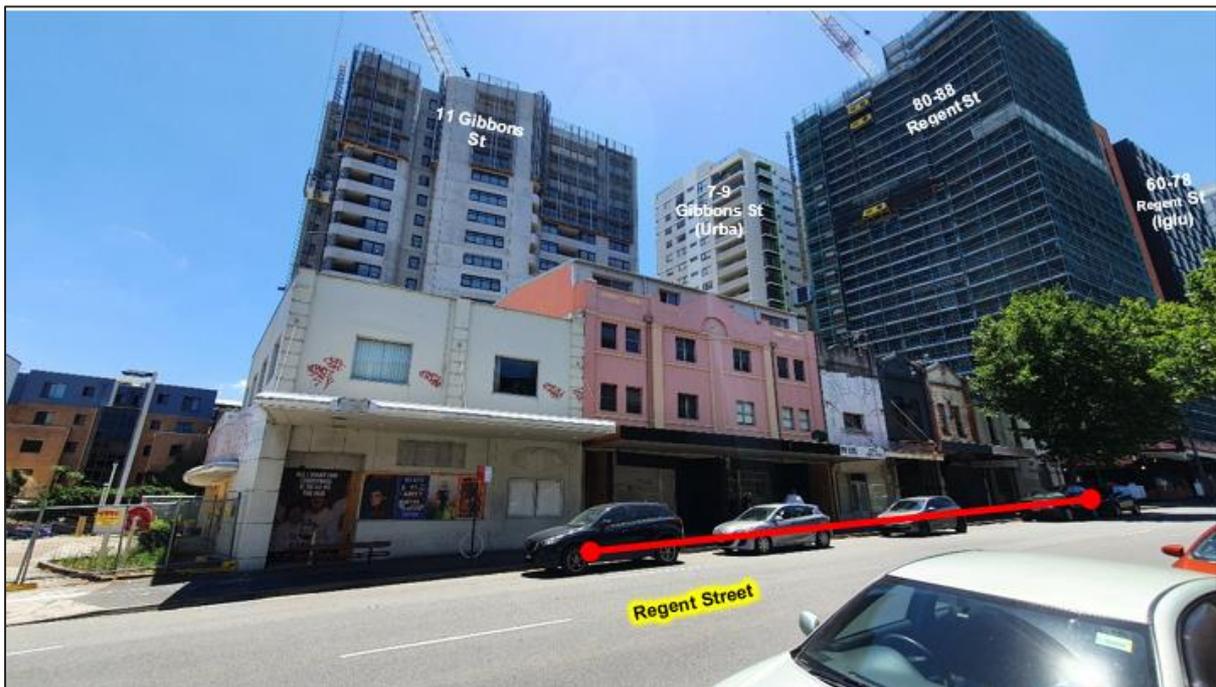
| Photograph of the site and existing development viewed from Regent Street looking north-west (source: Department's photograph)
